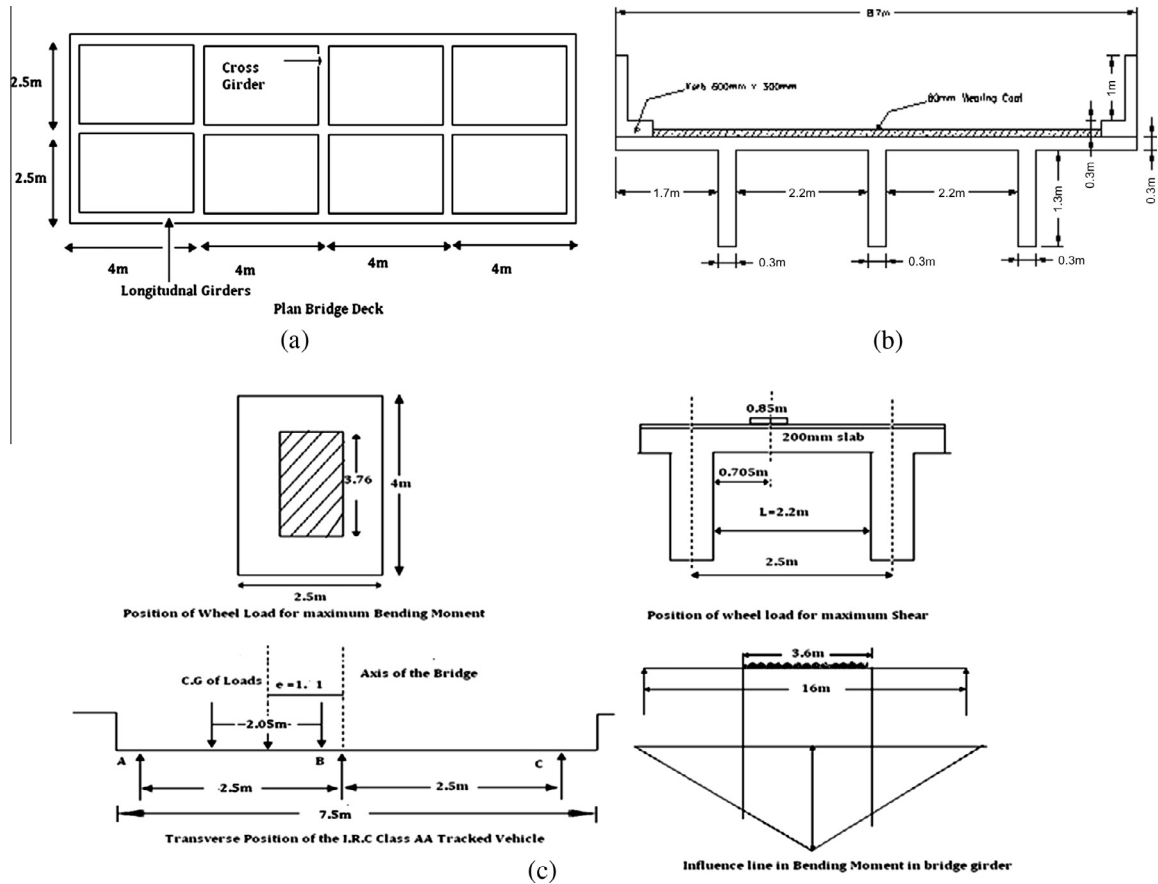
(a) Bridge deck plan (b) cross section of the bridge deck, [kerb 600 mm × 300 mm, deckslab thickness 0.2 m, breadth of cross girder is 0.3 m, wearing coat is 0.08 m, carriage ways is 7.5 m] (c) application of load on bridge.
